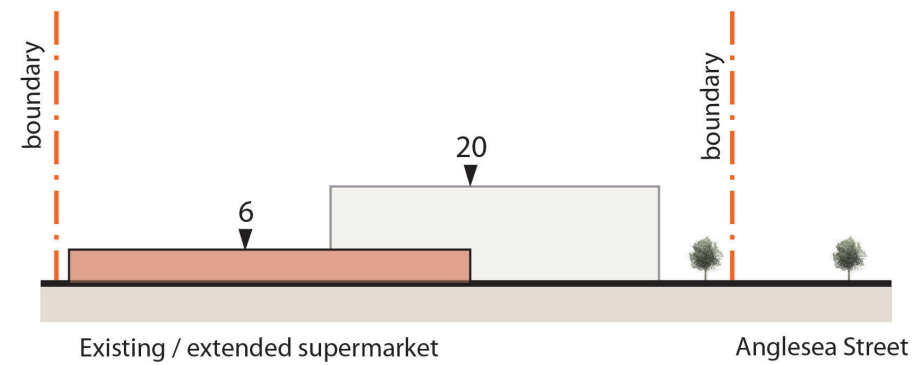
Indicative concept section A-A for Development Site 5 - Long term vision (not to scale)
